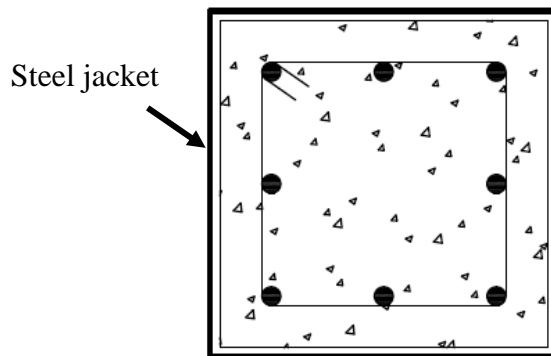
Standard steel jacket retrofit of square reinforced concrete columns
